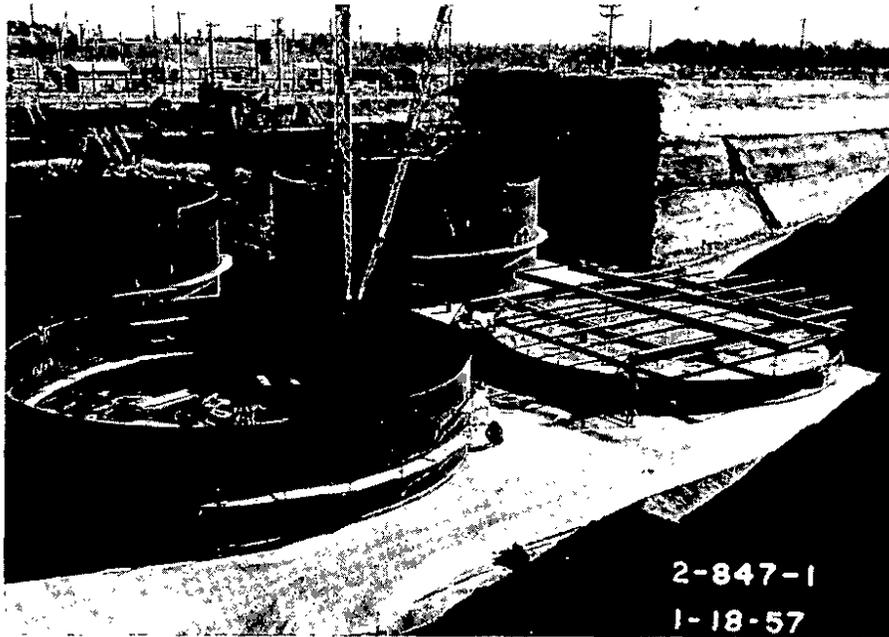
EXHIBIT VII-A ERECTION OF STEEL LINERS SHOWING ASSEMBLY OF WALL PLATES
